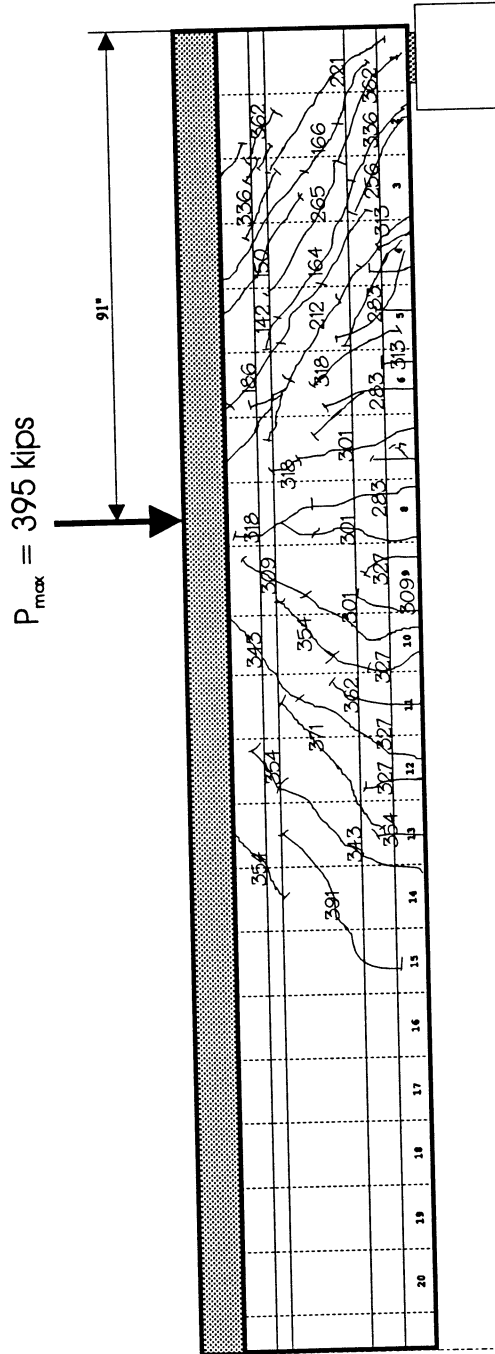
Cracking Pattern for Girder 2R-10-N
